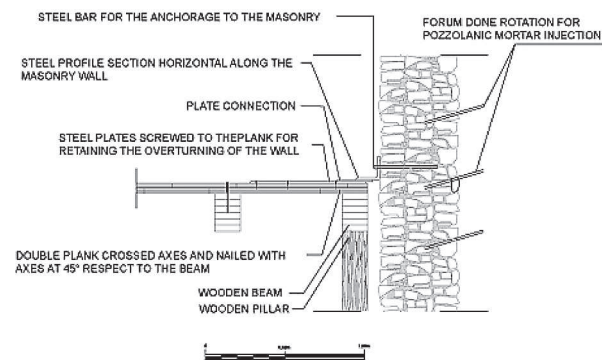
The link between a masonry wall and the wooden frame at a floor level
